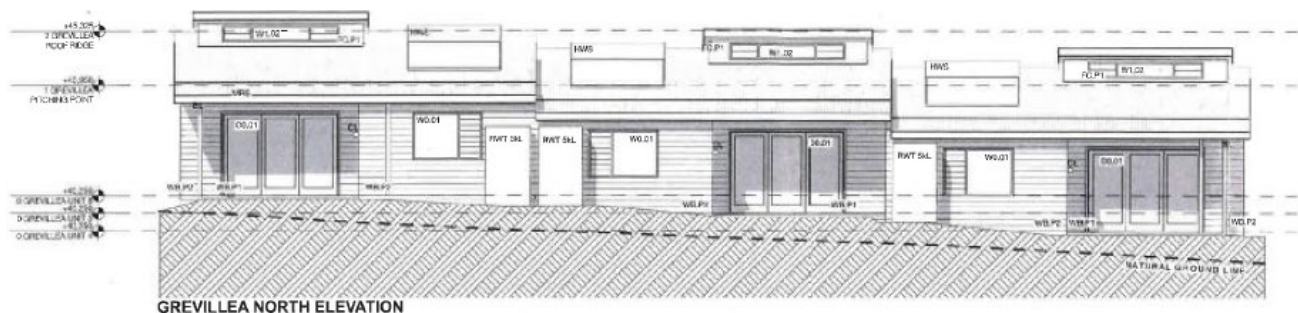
North elevation of DA2021/0226 which will be oriented towards 75-77 Sheppard Street (source: DA2021/0226).
